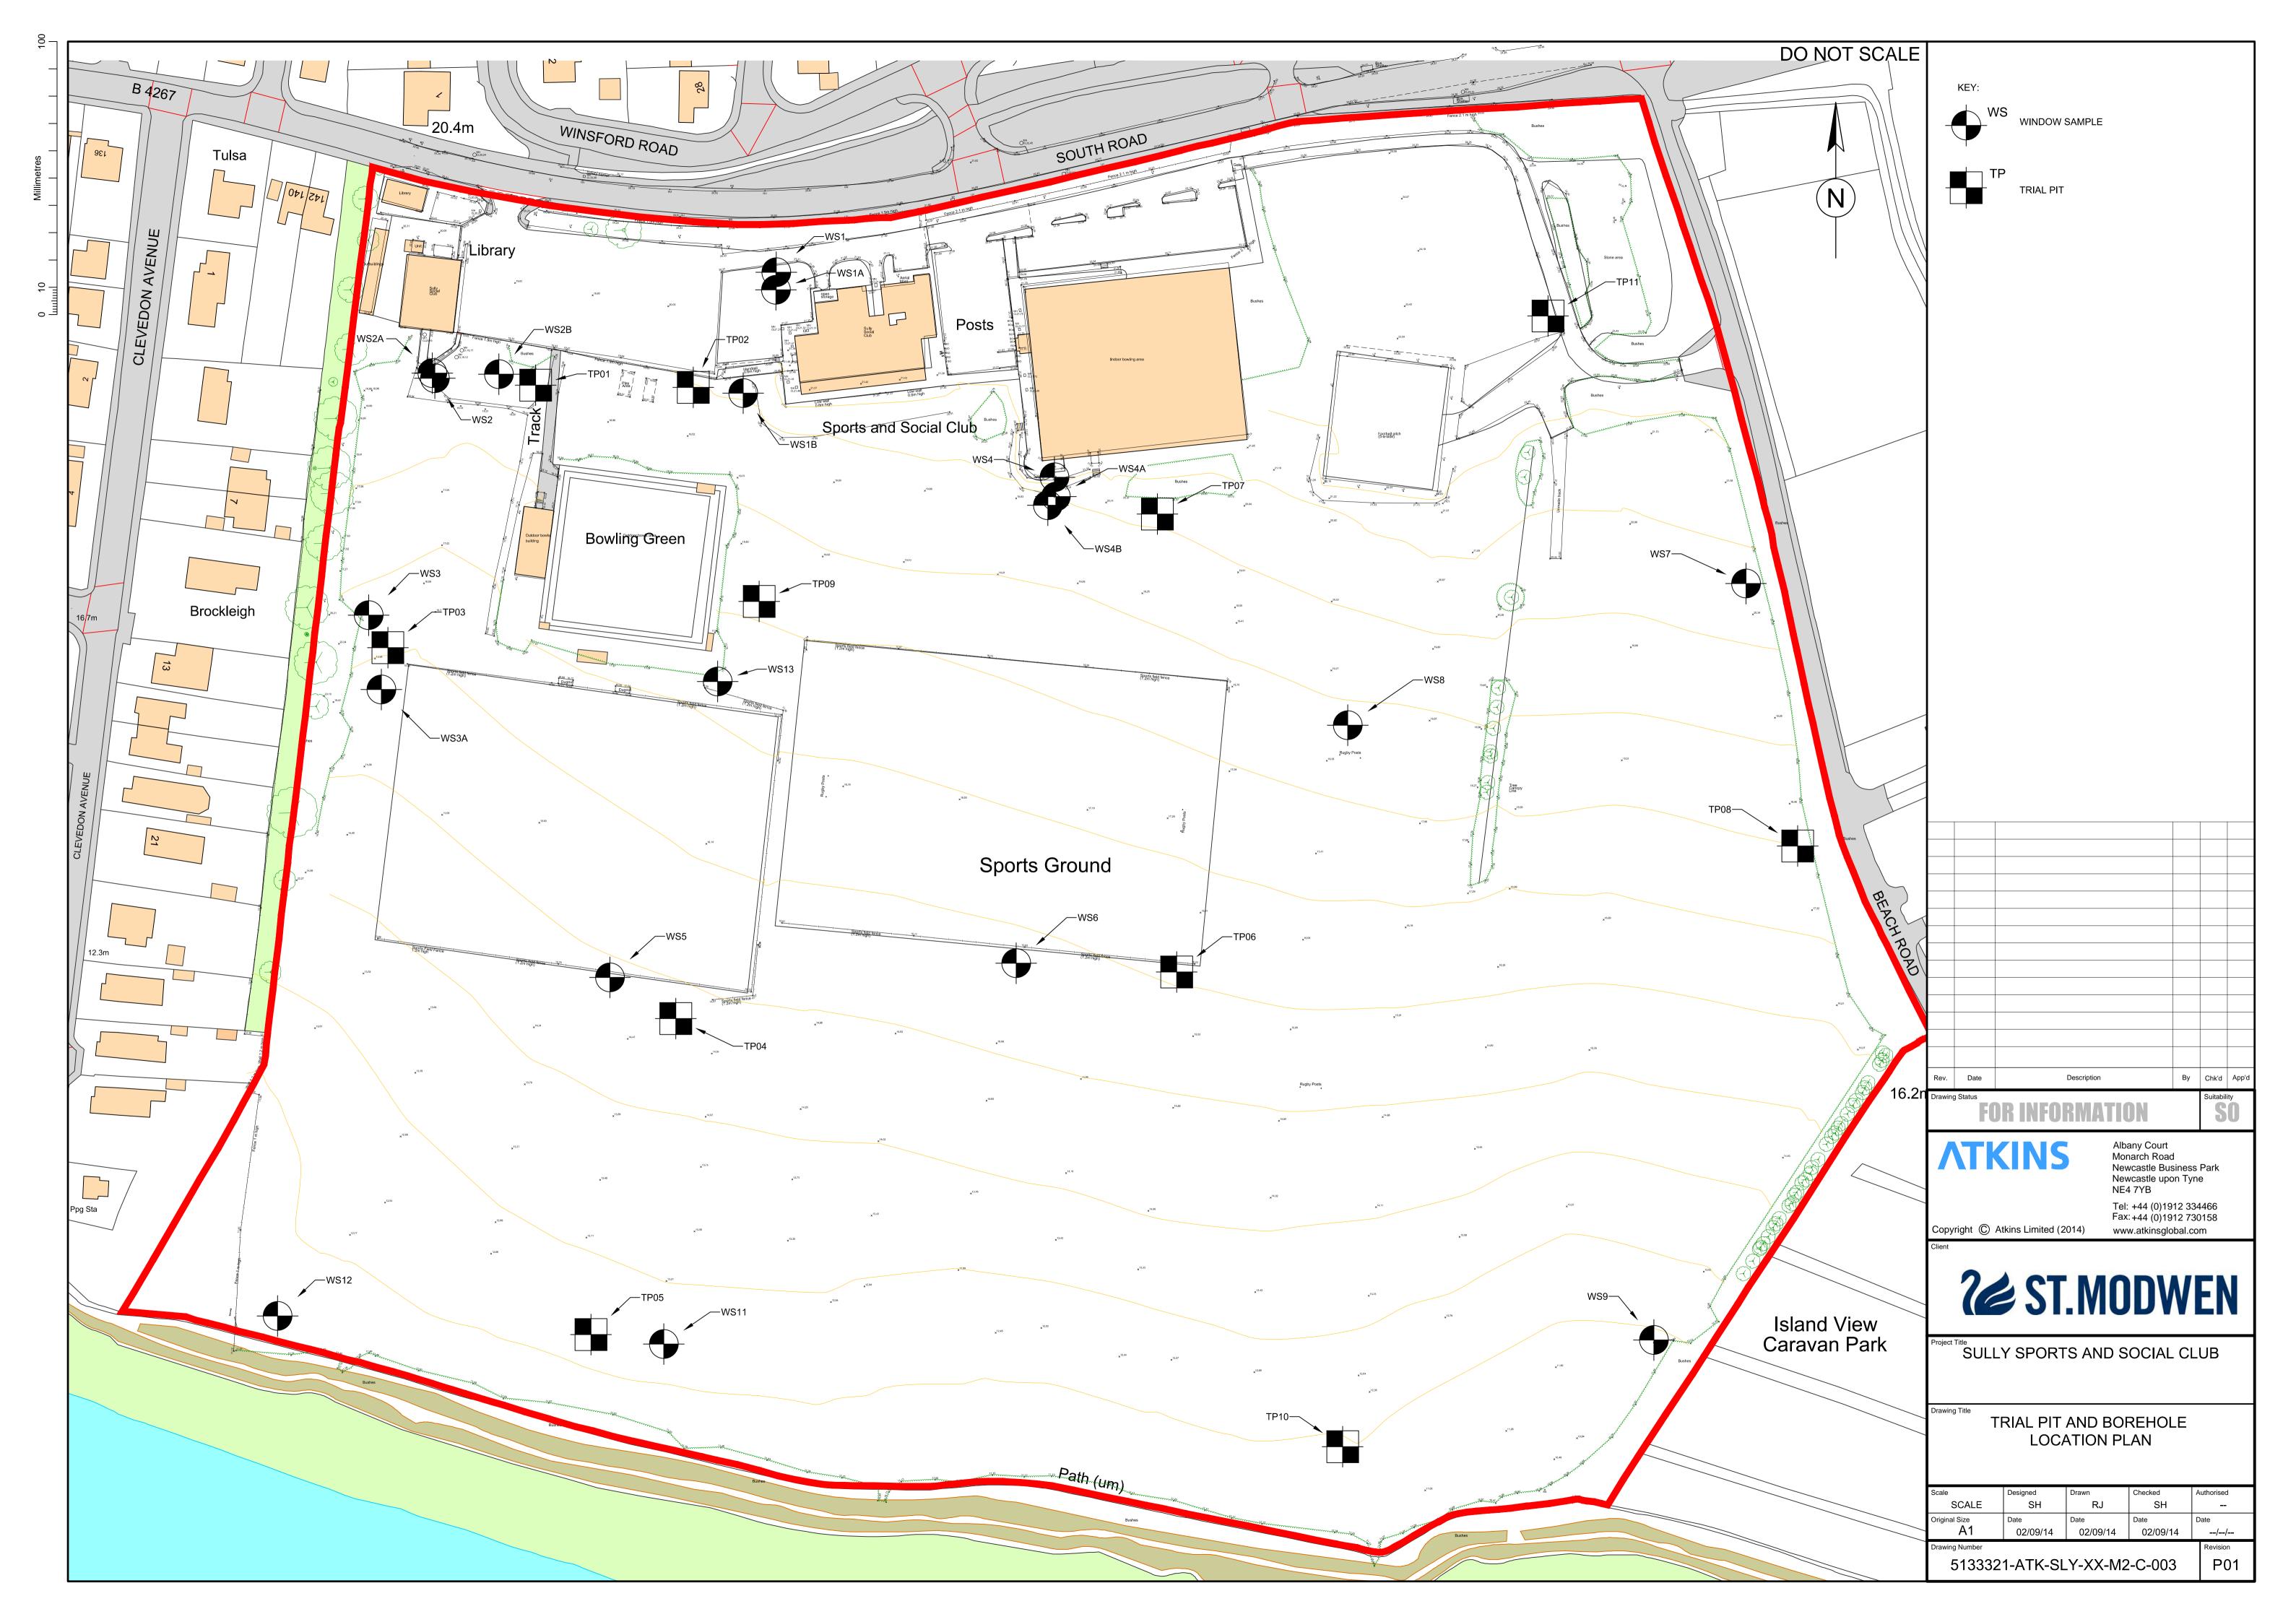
ATK-SLY-XX-M2-C-003 – Exploratory Hole Location Plan
